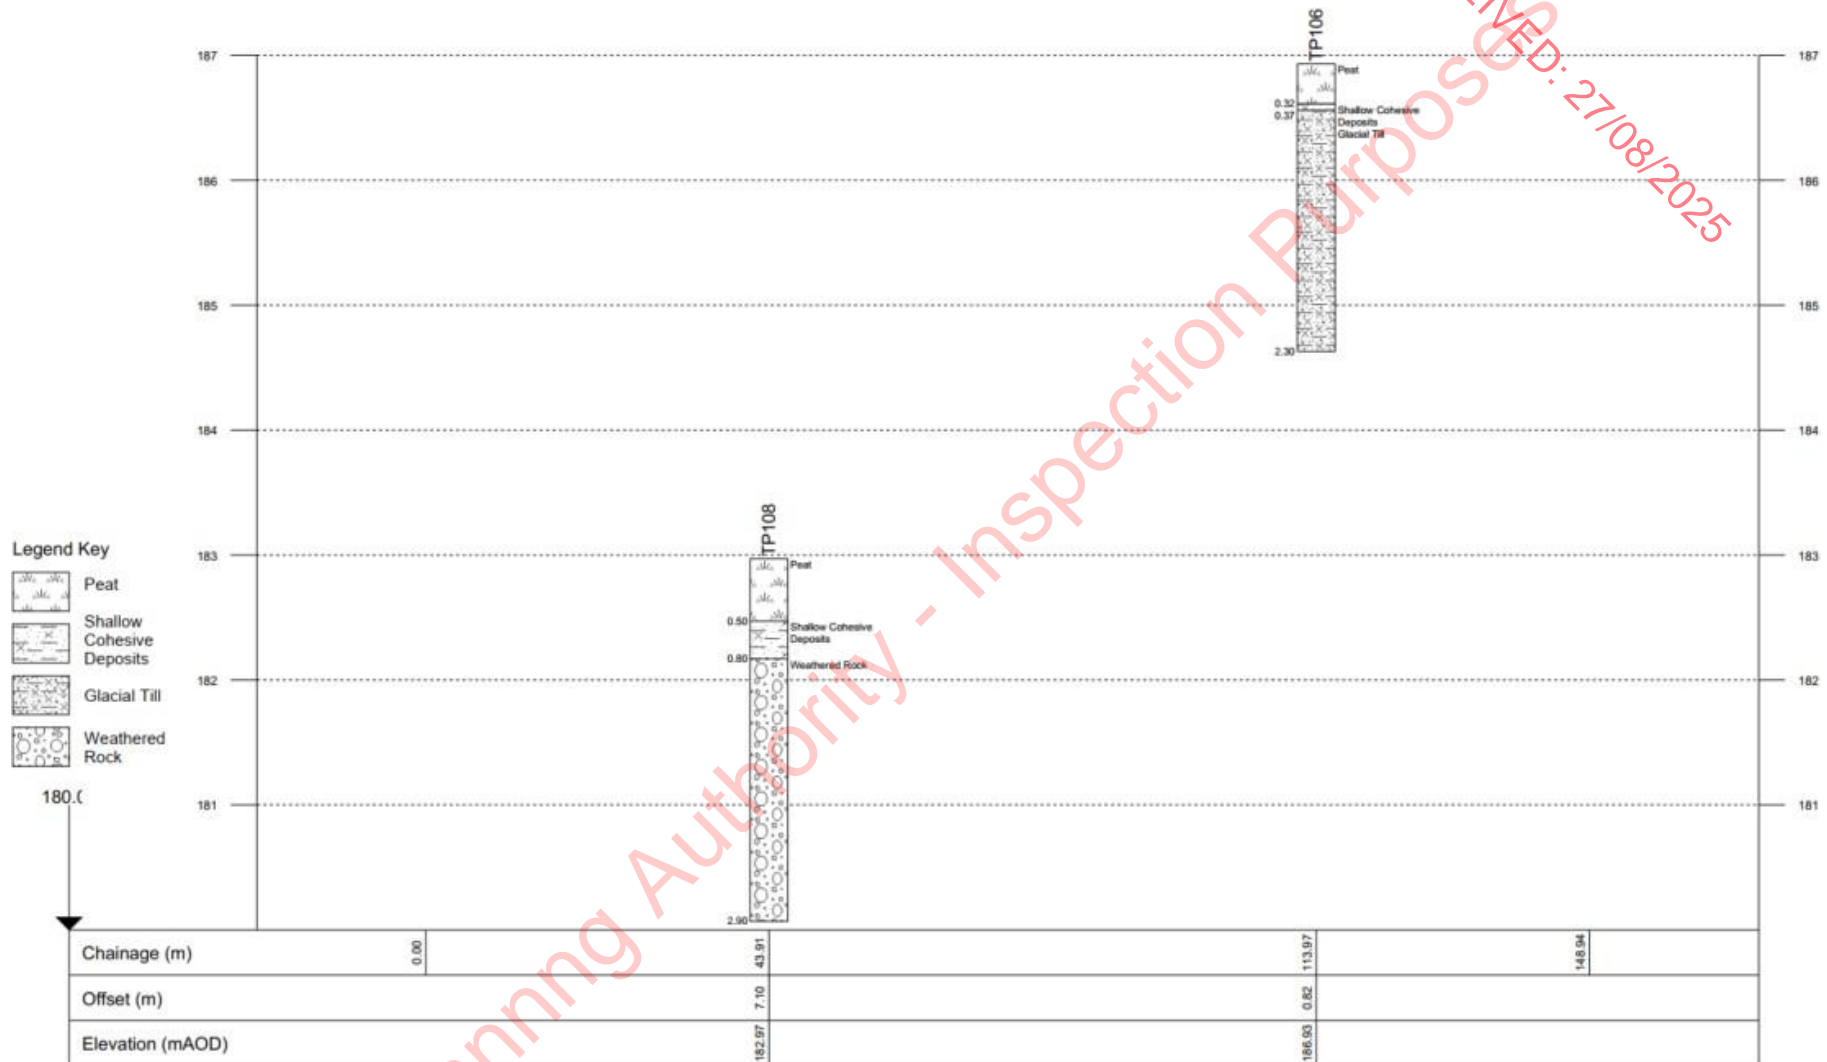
Borrow Pit 1 geotechnical cross-section
